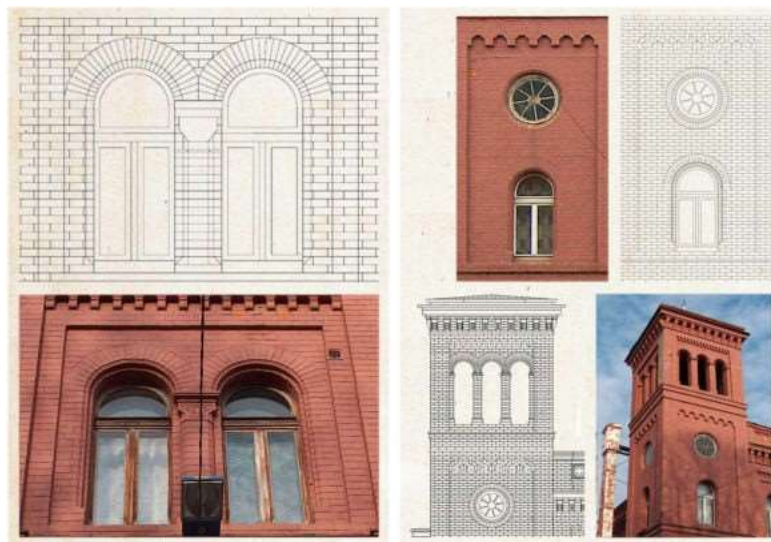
Details of windows and inventory, photos and drawings credit: DOMUS,
